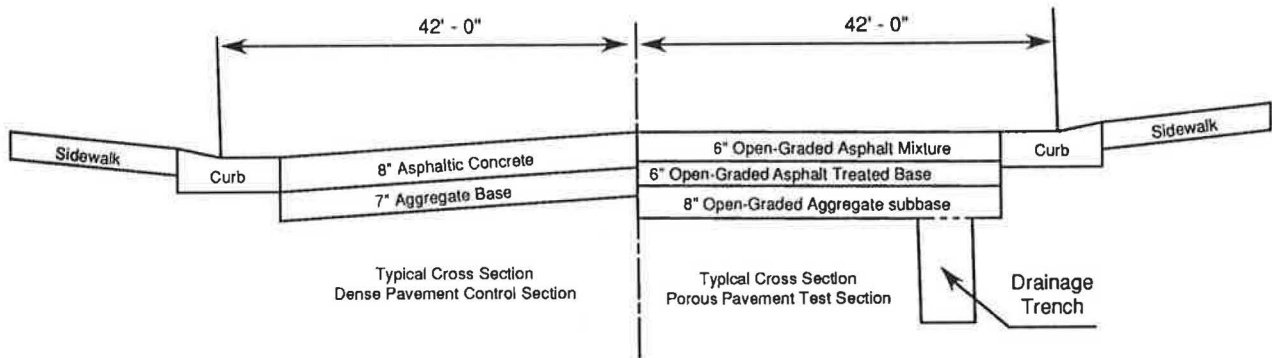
Typical cross section of ADOT's experimental porous pavement.
